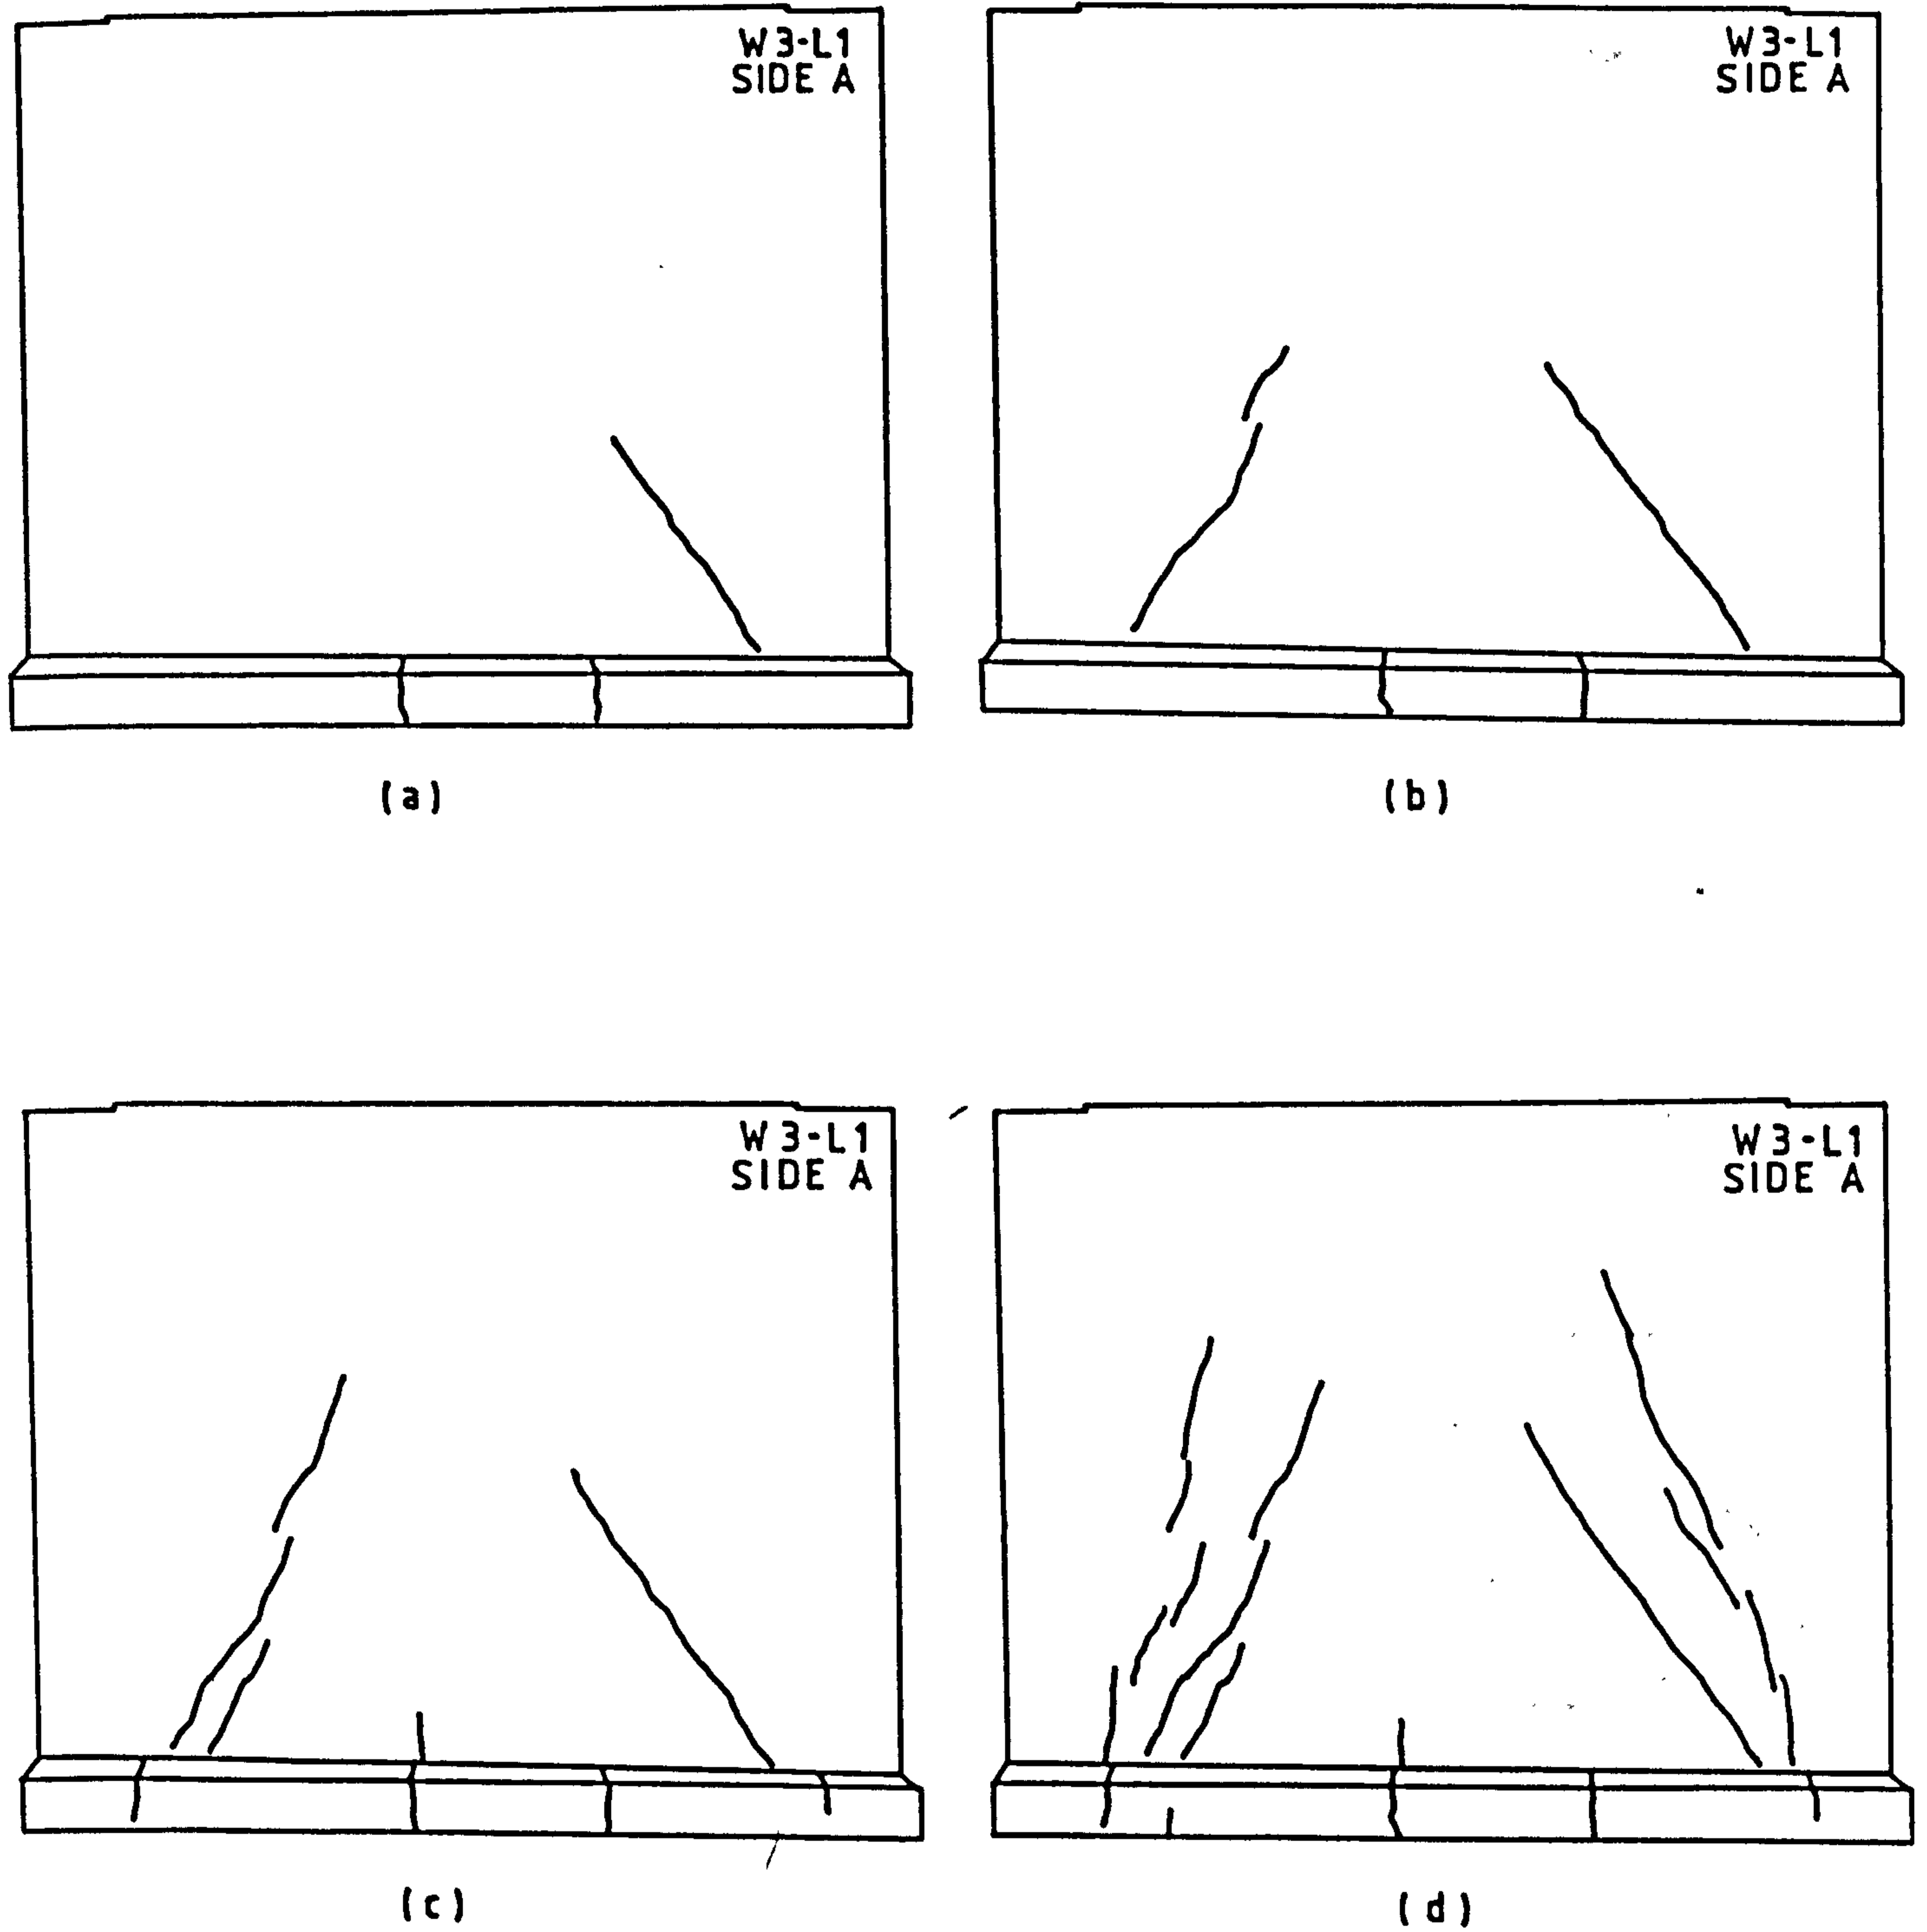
Development of cracks in wall W3-L1
